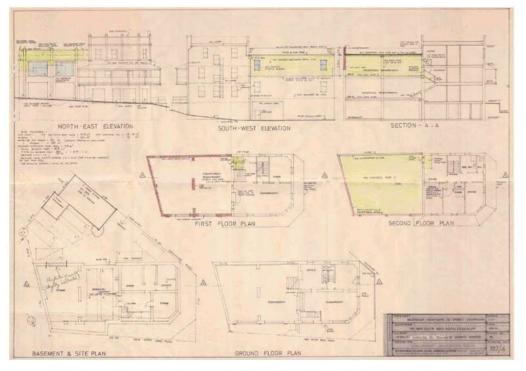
Plans submitted for the construction of an additional level above the eastern showroom (86/30). This scheme was not approved.
